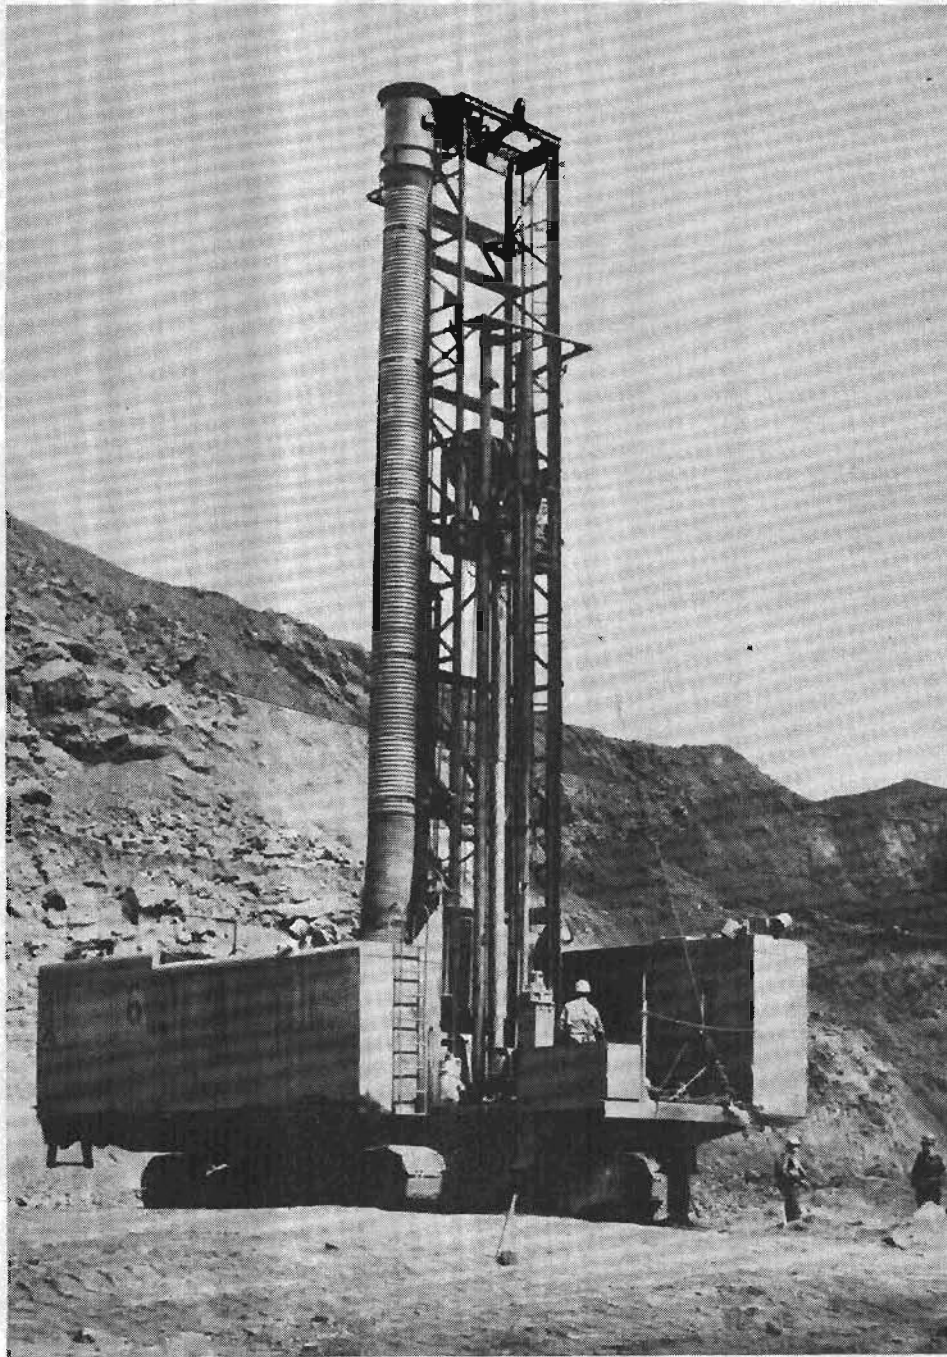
MODIFIED BLAST HOLE DRILL
